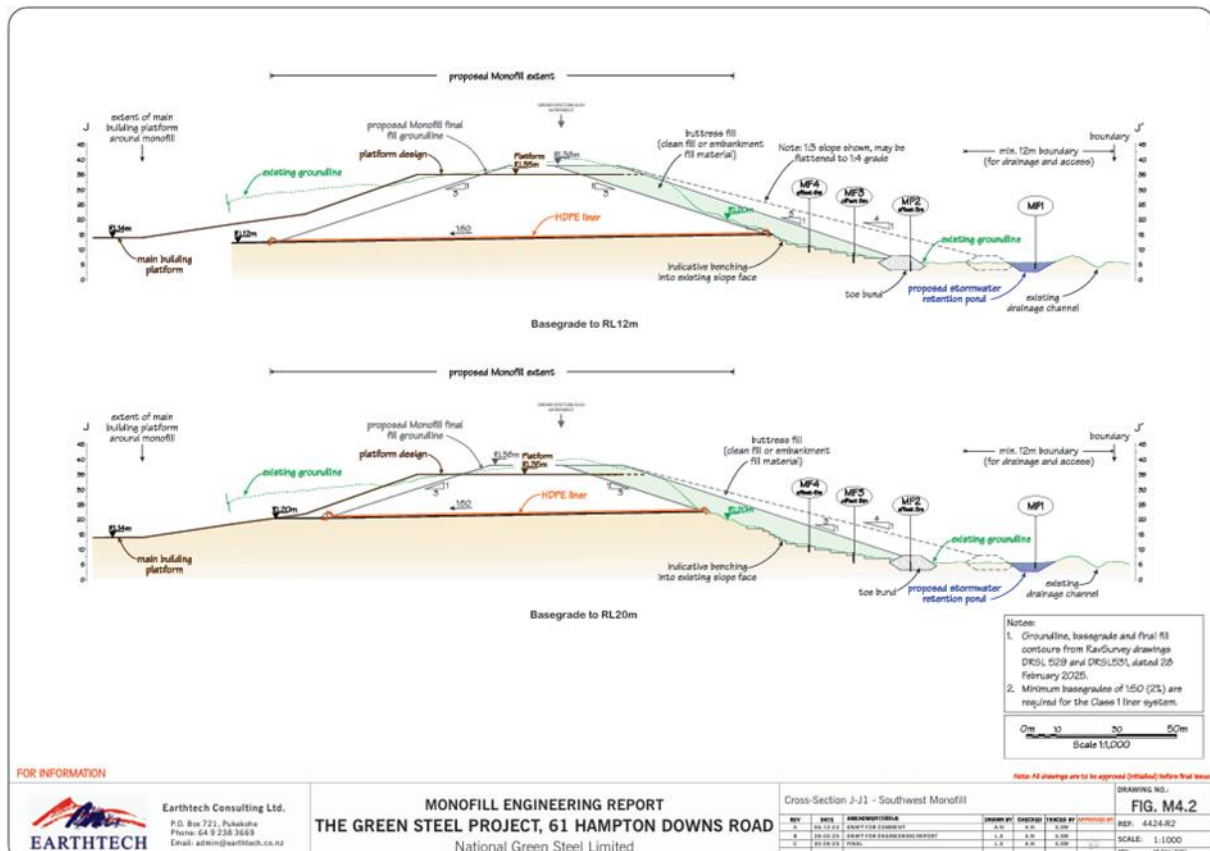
Proposed Southwest Monofill Indicative Cross Section (Source: Earthtech Report Attachment 17)
